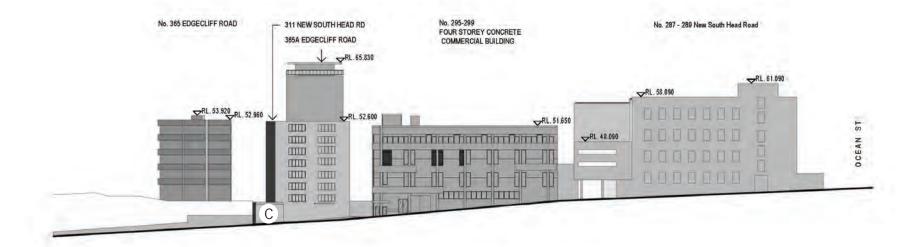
Indicative streetscape elevations (Adapted from elevations by Antoniades Architects).
